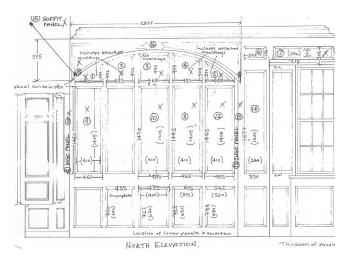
Norie Room Diagram of dimension of panel on North Wall
